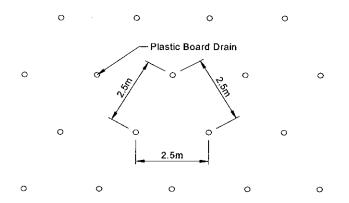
LAYOUT OF PLASTIC BOARD DRAIN
